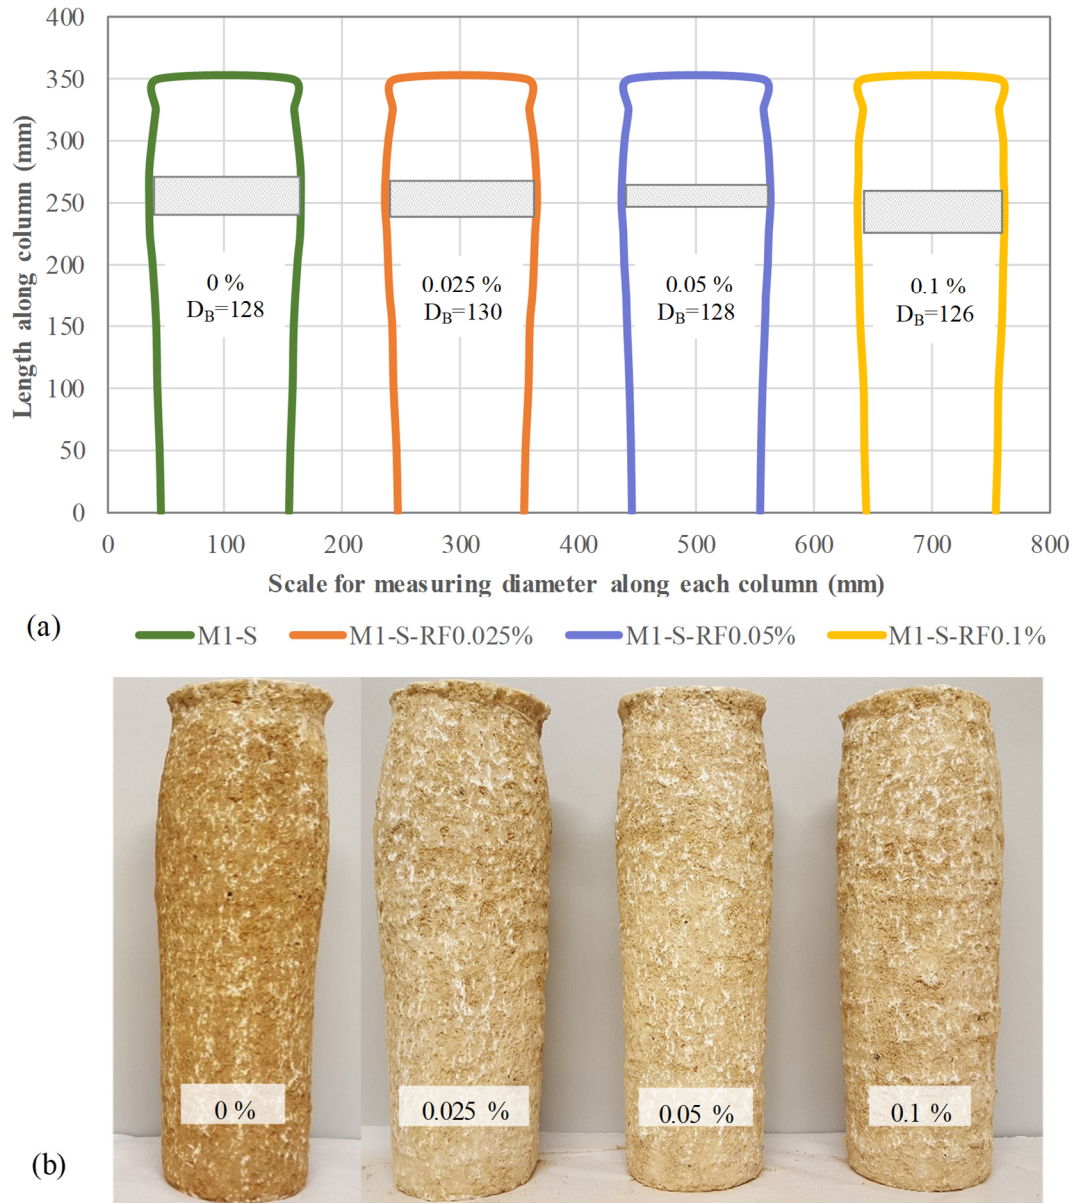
Deformations of tested columns reinforced with randomly mixed PET fibres, and installed in a base silt at OMC, (a) graphical plot and (b) pictorial illustration
